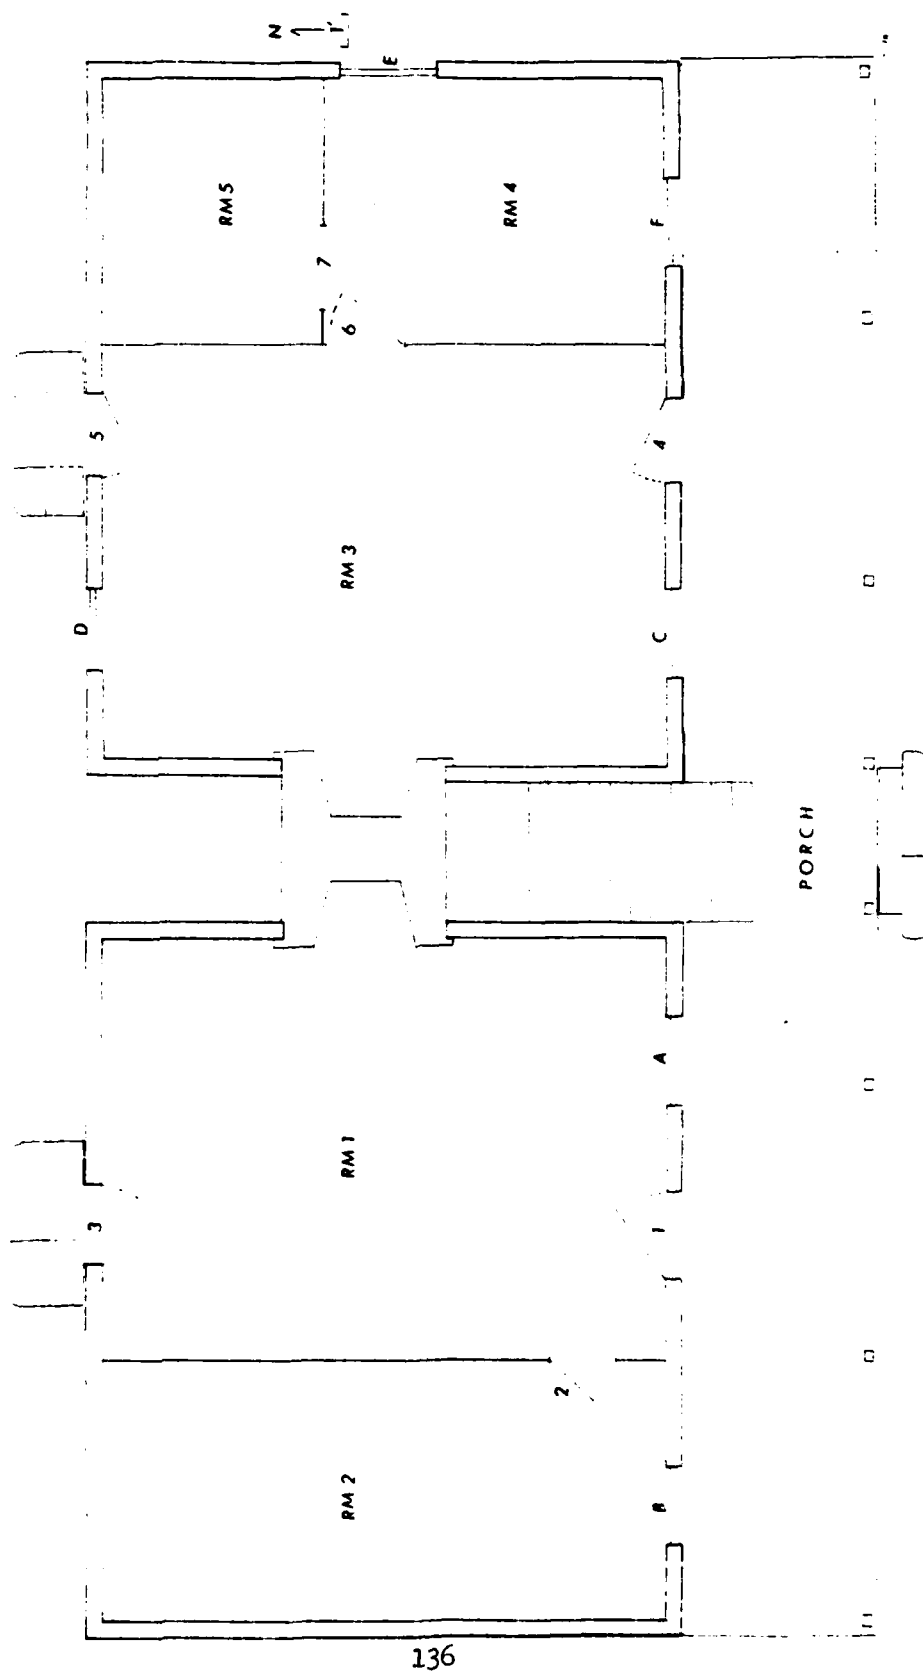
Floor plan of lower storey Horton/Kitchen home.
